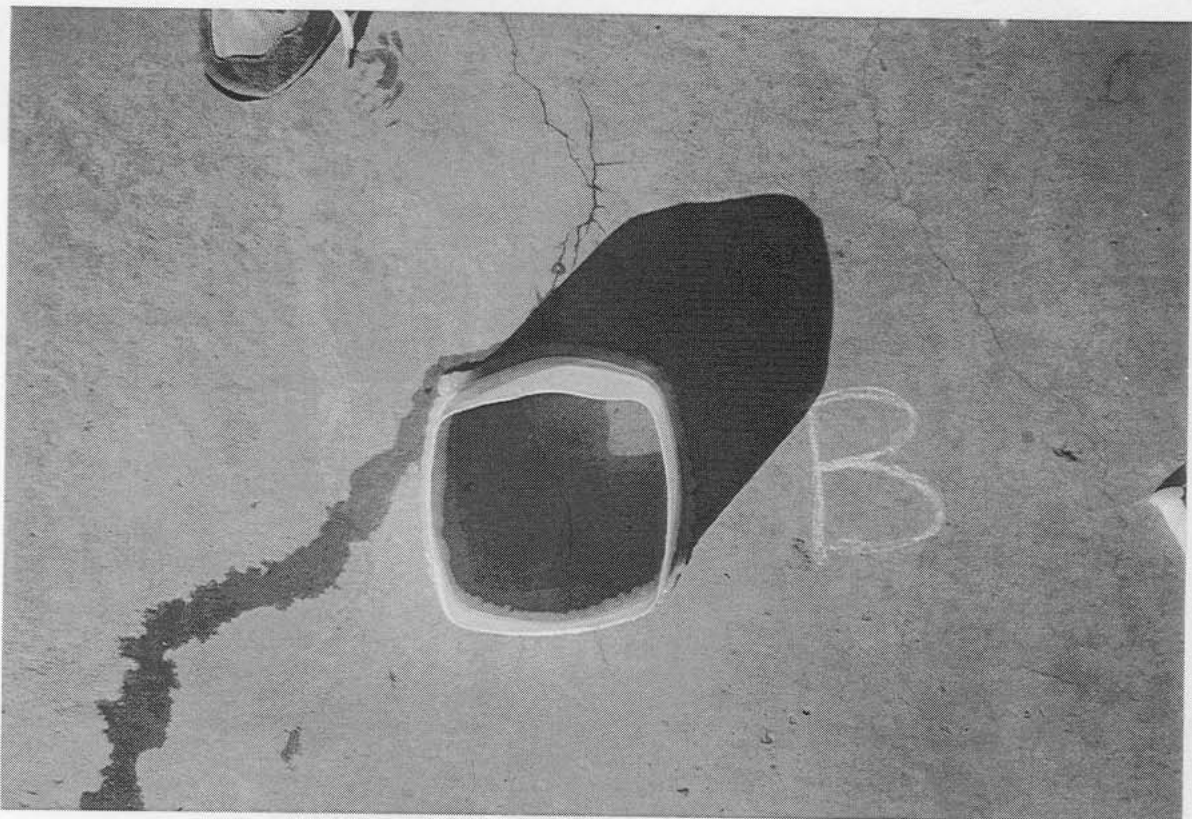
View of weeping construction joint from inside tower. Note large build up of Calcium deposits.
